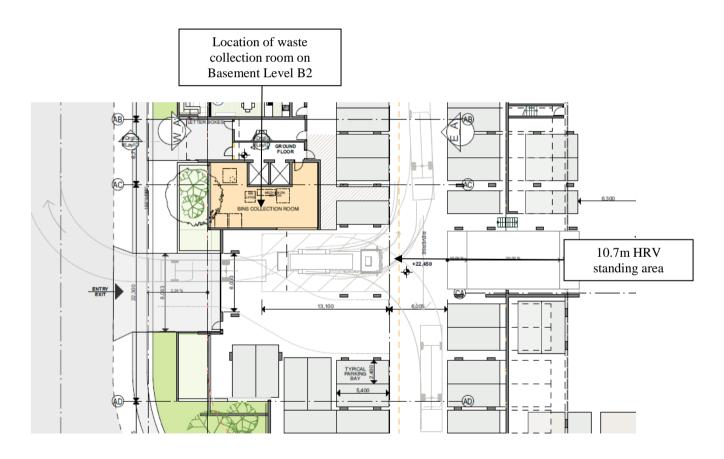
Extract from Architectural Plans (DA-1100 Issue F) (image courtesy of CKDS Architecture)
